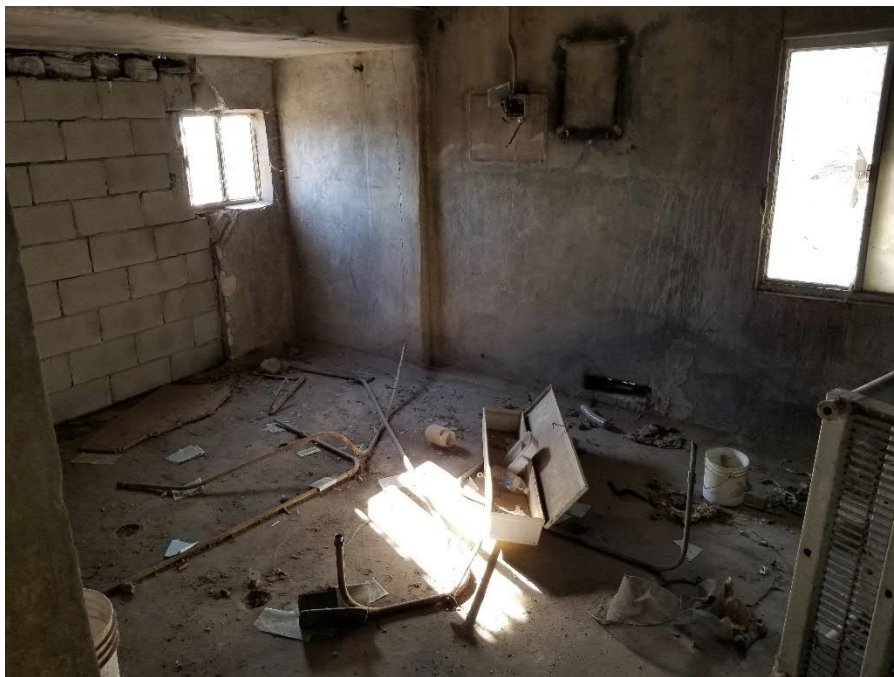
Interior view of abandoned dairy building with debris indicative of past use.
